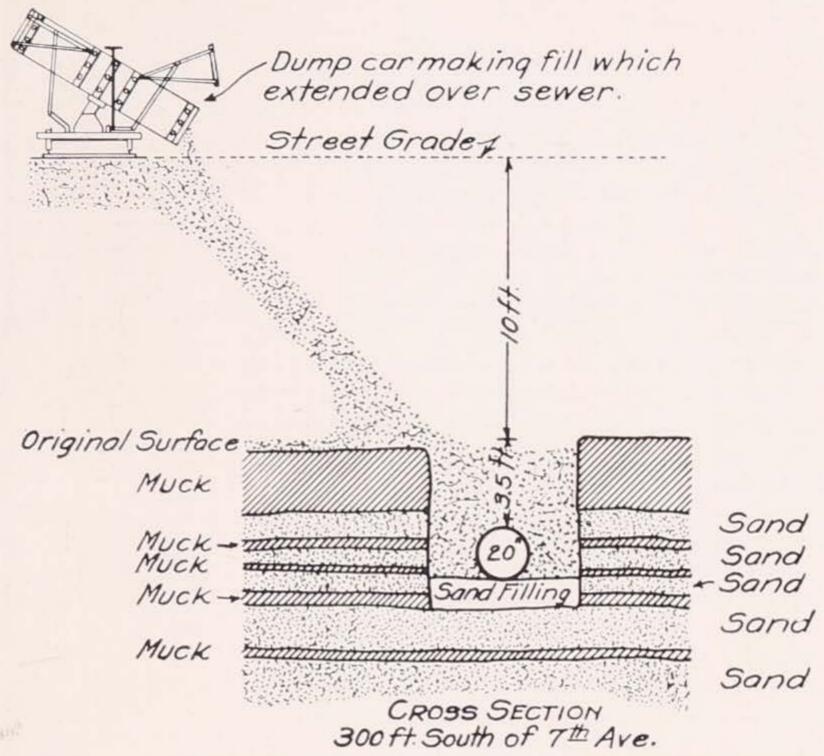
Conditions under which 20 Inch Vitrified Sewer Pipe Cracked in Alley 8, Gary Ind., 1908.
